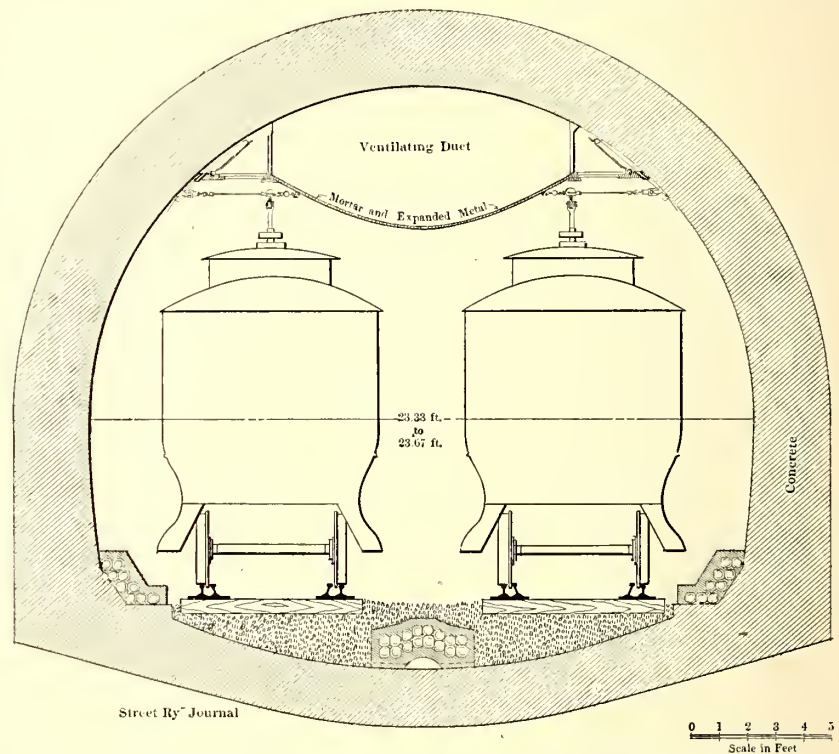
CROSS-SECTION OF EAST BOSTON TUNNEL UNDER THE HARBOR
